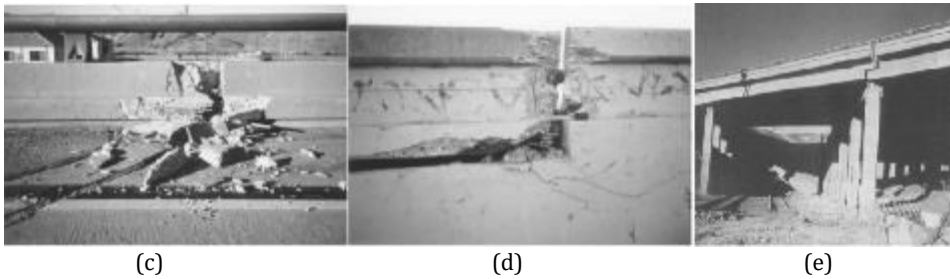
Santa Clara River Bridge pounding damage in the 1994 Northridge earthquake. (c) Barrier railpounding damage; (d) abutment pounding damage; (e) Unseating 1971 San Fernando earthquake (sample span, due to bridge skew).
